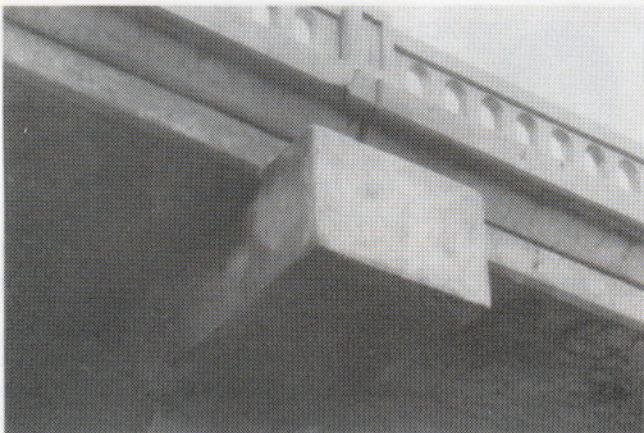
Completed pier after encasing all elements in shotcrete.
